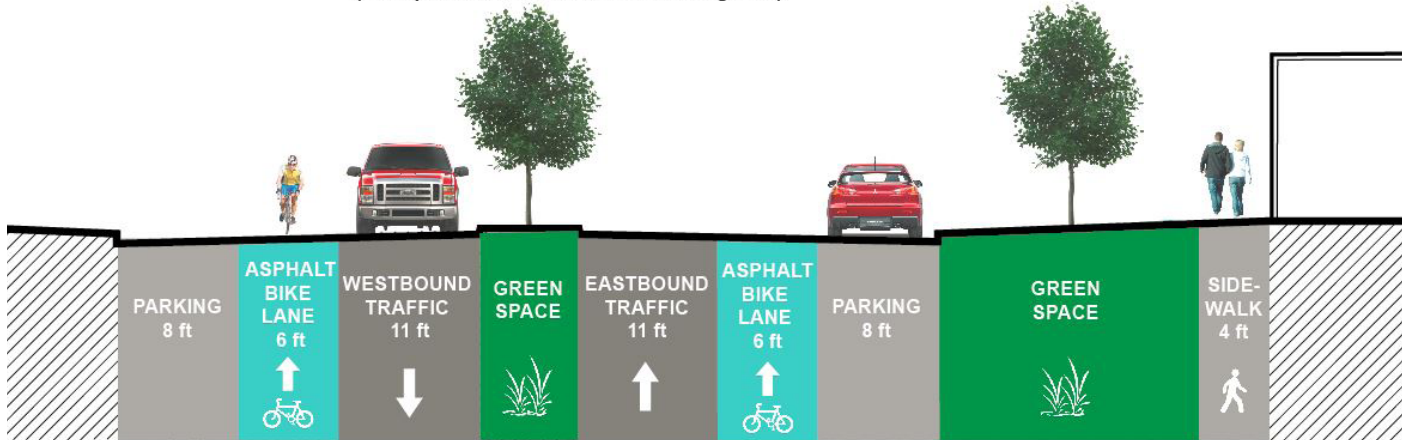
Redesign of US-23. The proposed complete streets/boulevard layout features only one lane of traffic in each direction, crosswalks that increase safety for crossing pedestrians, reduced paved area to reduce stormwater runoff, and bike lanes that connect with regional trails. The overall width of the roadway is not changed, and the design allows for safer pedestrian crossing. Source: Sustainable Small Harbors
